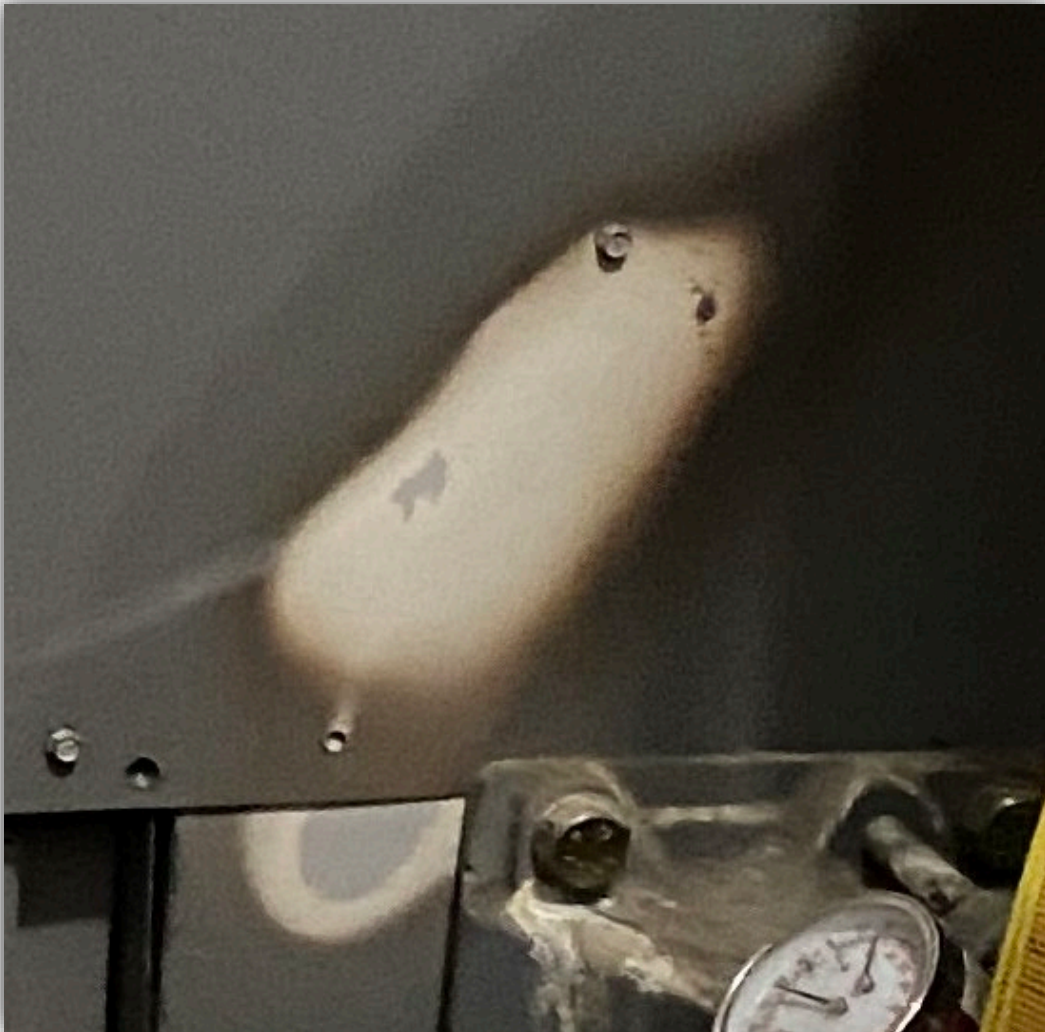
Close up of hot spot on the side of the boiler where flames became trapped in boiler sheet metal.
